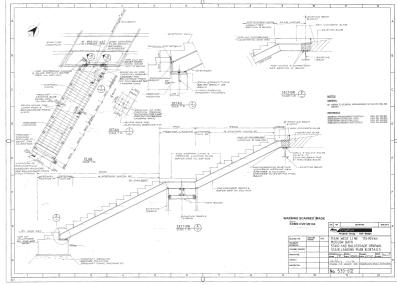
1994. Medlow Bath Stair and Balustrade Renewal, Stair, Landing Plan & Details
